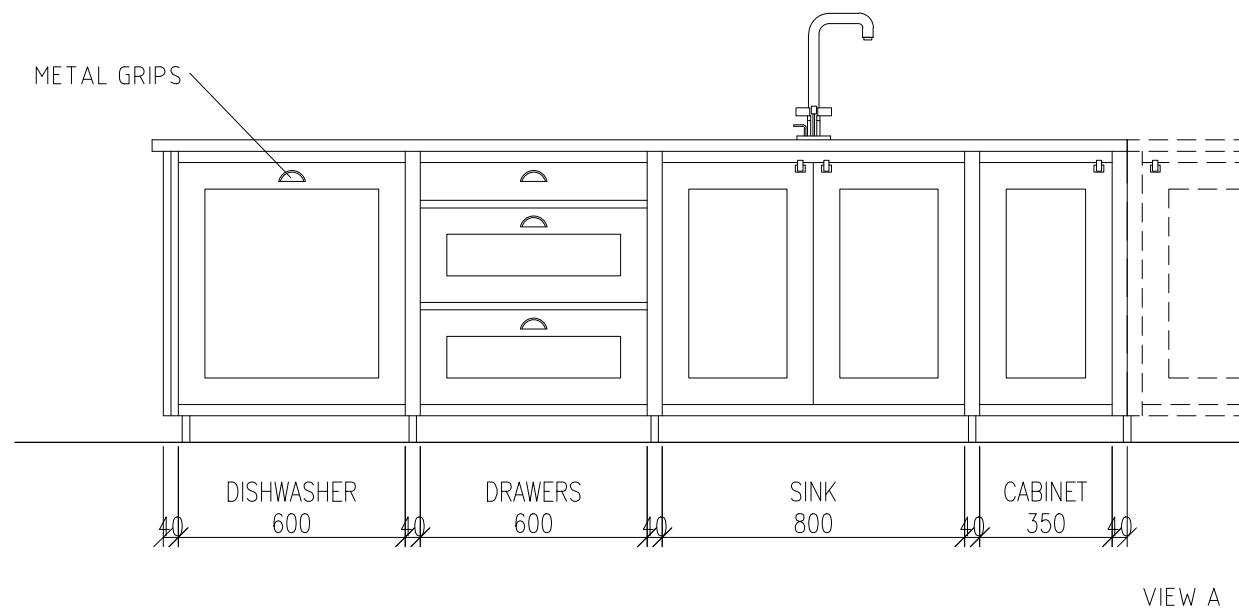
Kitchen front elevation, 1st floor. Scale 1:20.
